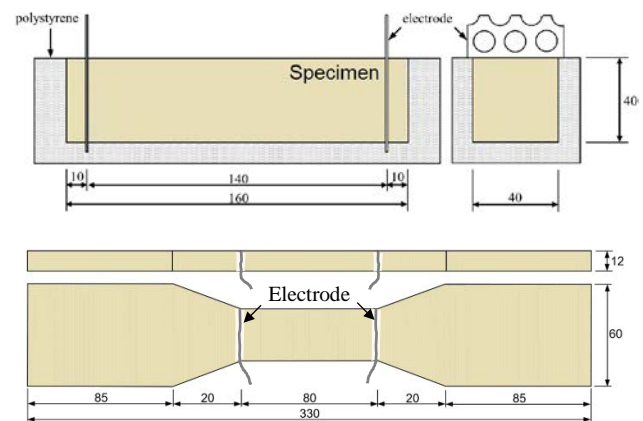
Dimensions of prismatic specimen for hydration study and dog-bone shaped specimen for piezo-impedance study. All dimensions in mm
